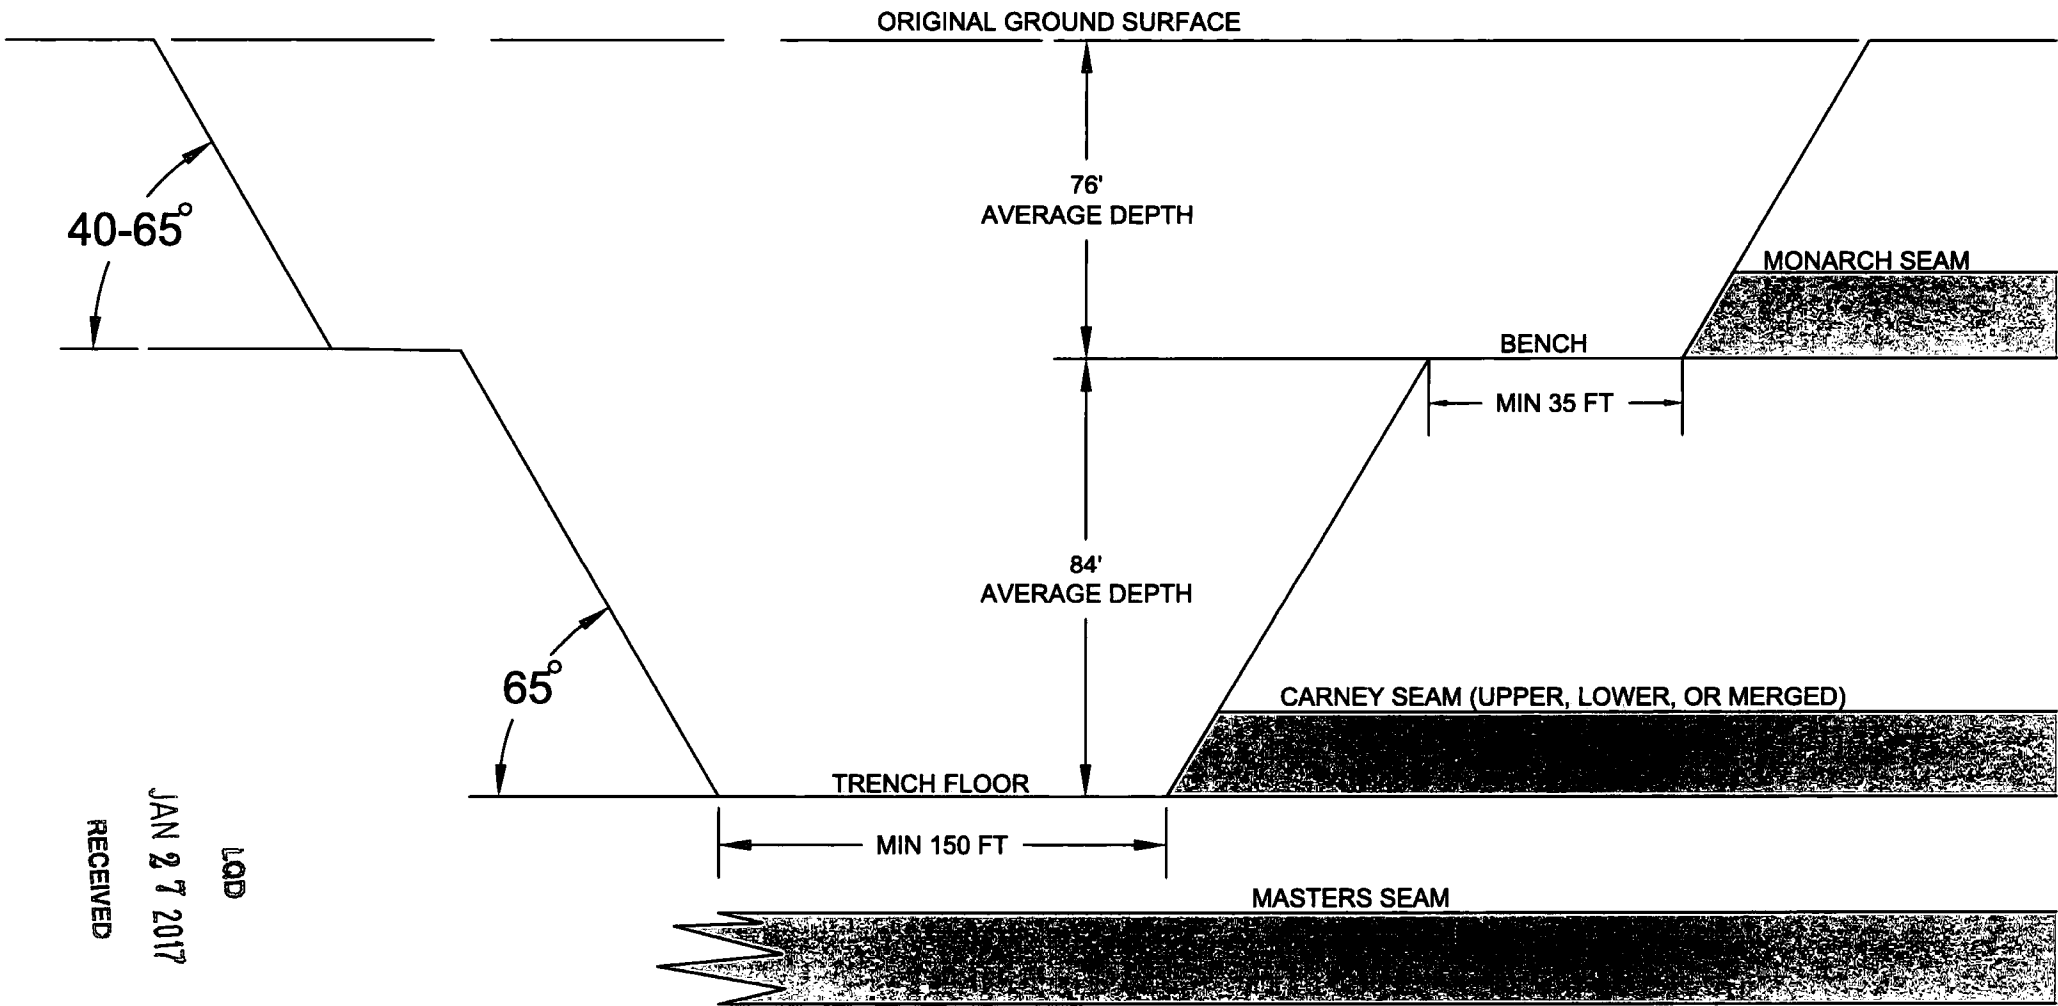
ILLUSTRATION OF PROPOSED HIGHWALL MINING OF COAL VIA STRIP-MINED TRENCH EXCAVATIONS (SEE P. MP-F2)
